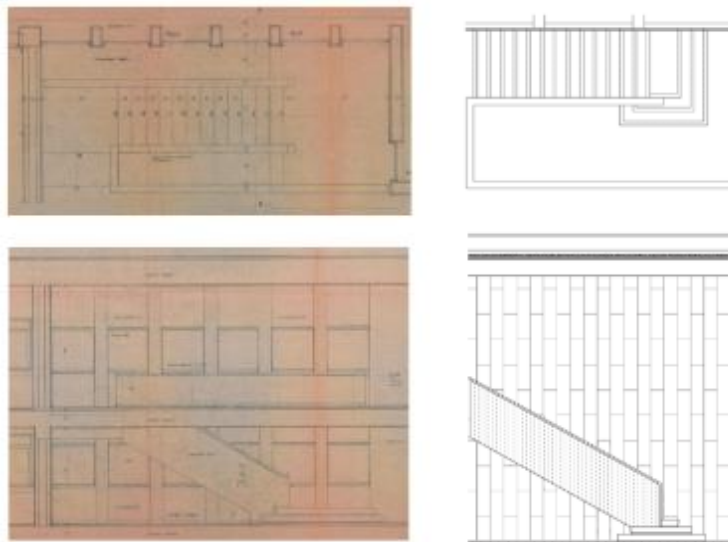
Plan and section drawing of the staircase located at the gallery space of the Rectorate building (left, Salt Archives) and similar use at the School of Mathematics building (right, by the Author).
